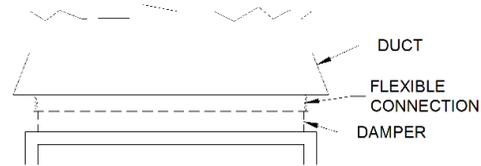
Front view of Return duct to be large enough to cover exposed area
